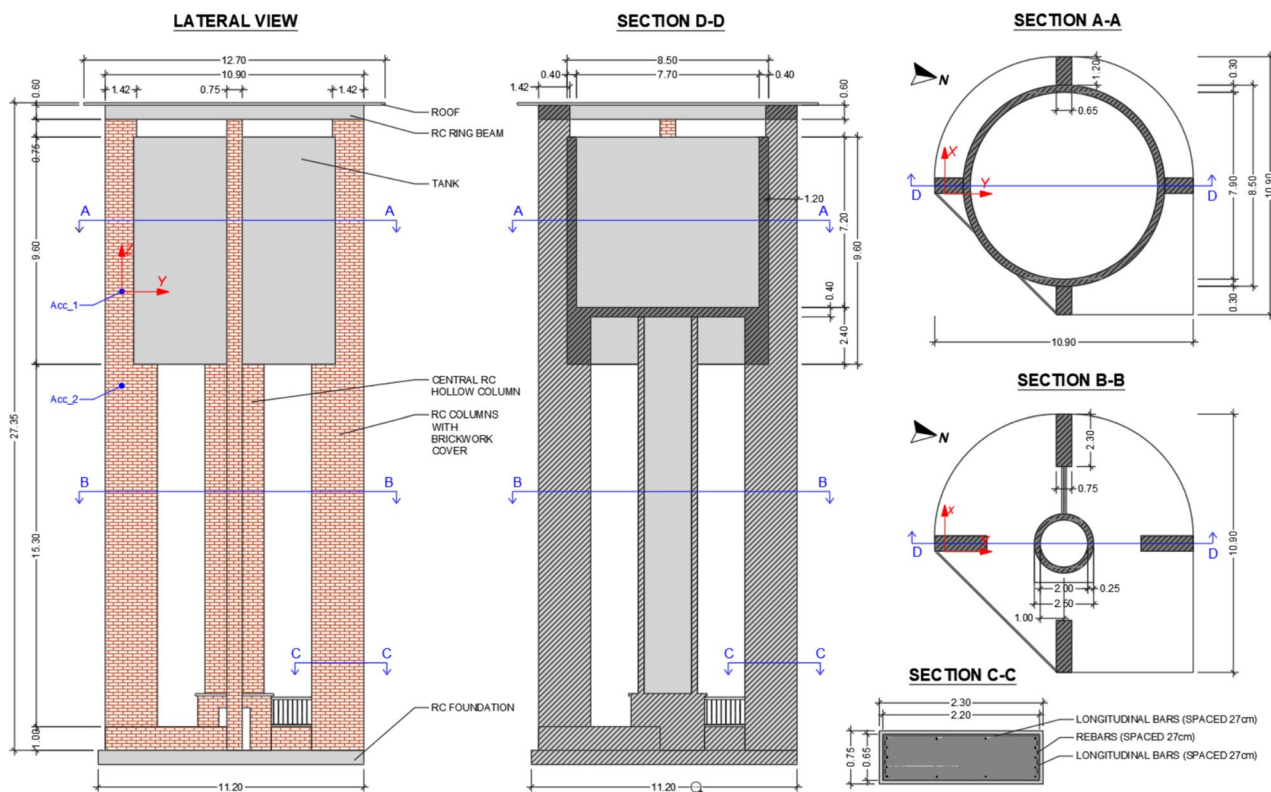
Lateral view, and vertical and horizontal cross sections of Tiburtina elevated water tank
